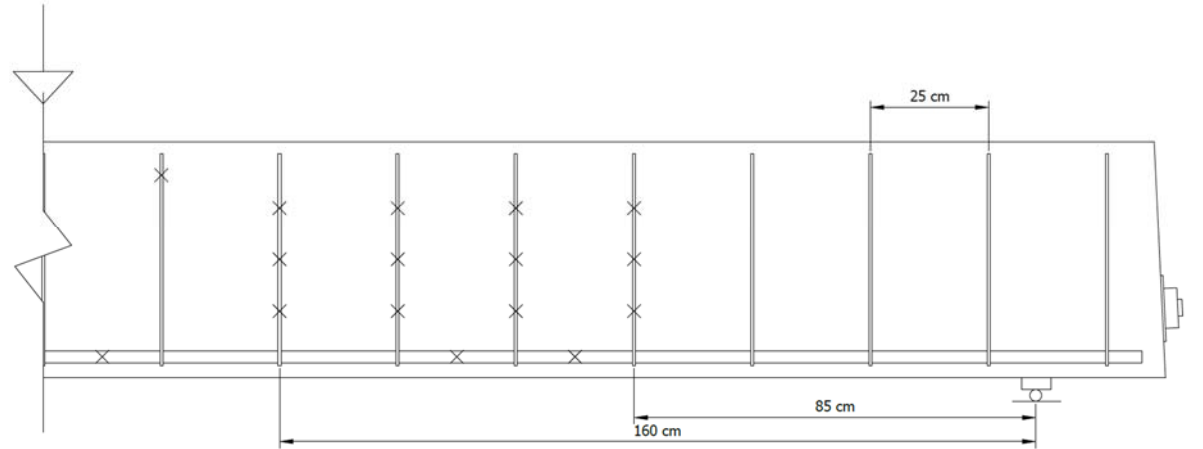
Strain gauge distribution for a 250mm stirrup spacing beam, on a short span shear test
